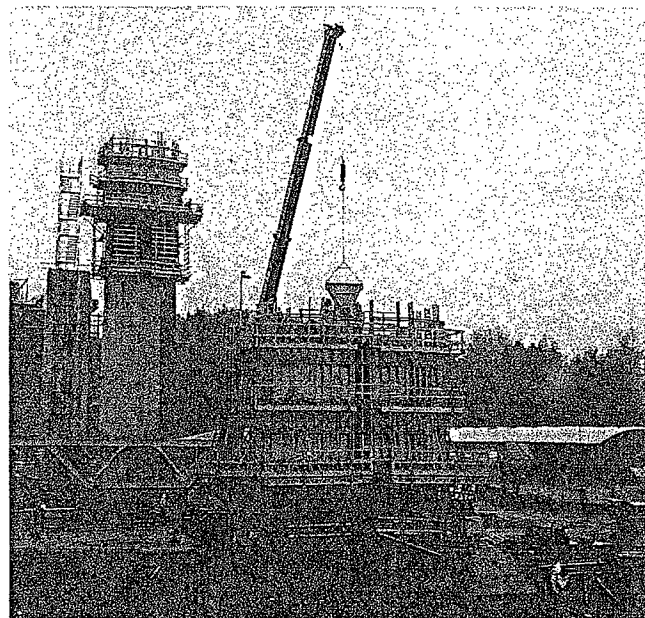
Casting of a bridge pier of a railway bridge south of Stockholm.
